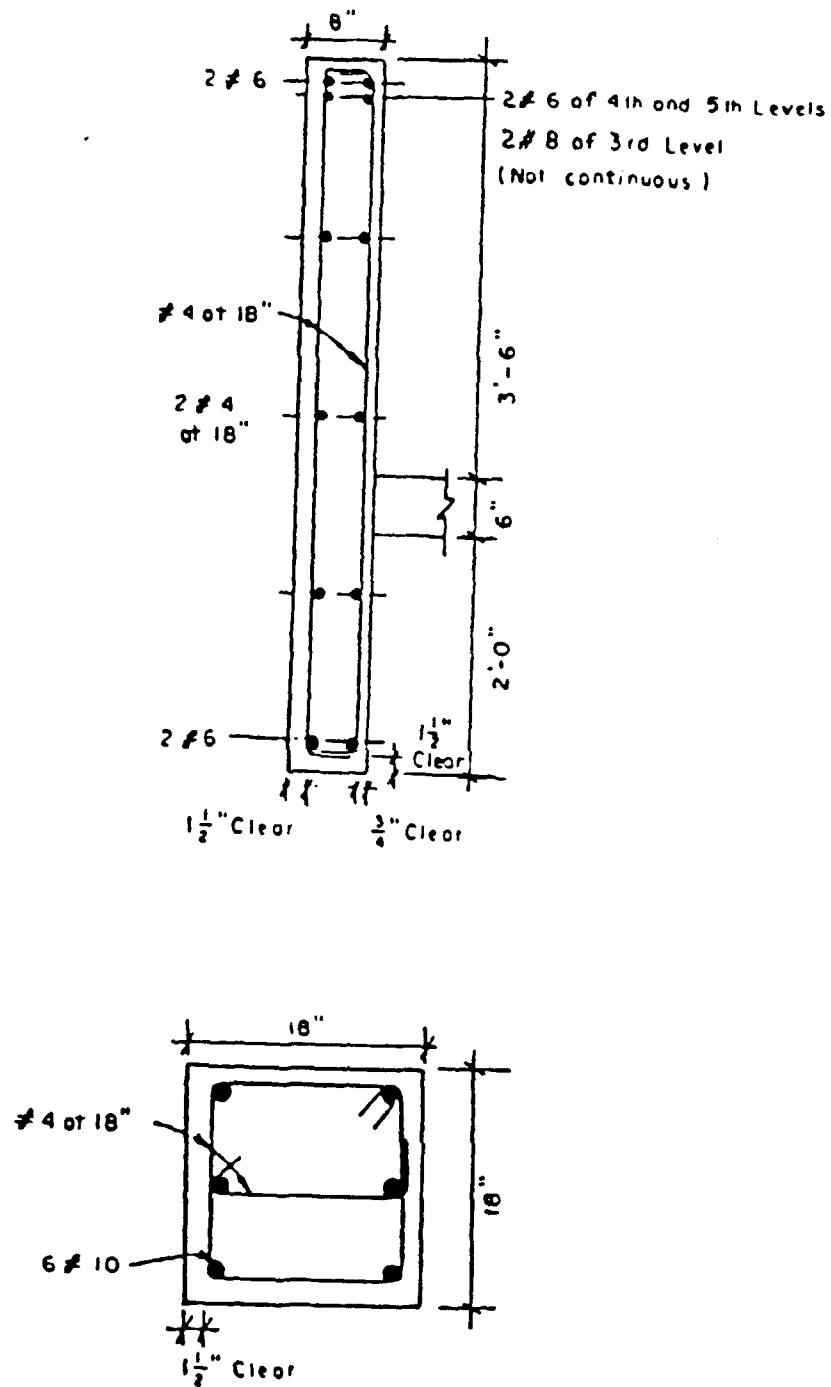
Cross section of beam and column of prototype frame [7]
